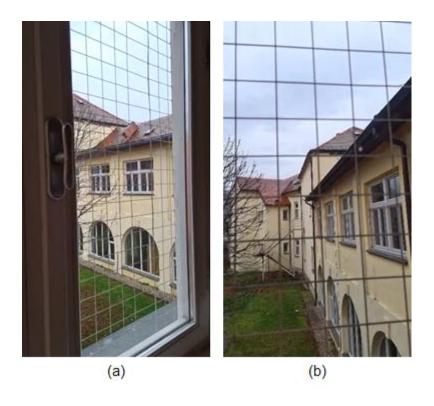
Collapsed chimneys (source: Nenad Bijelić and Damir Lazarević).
